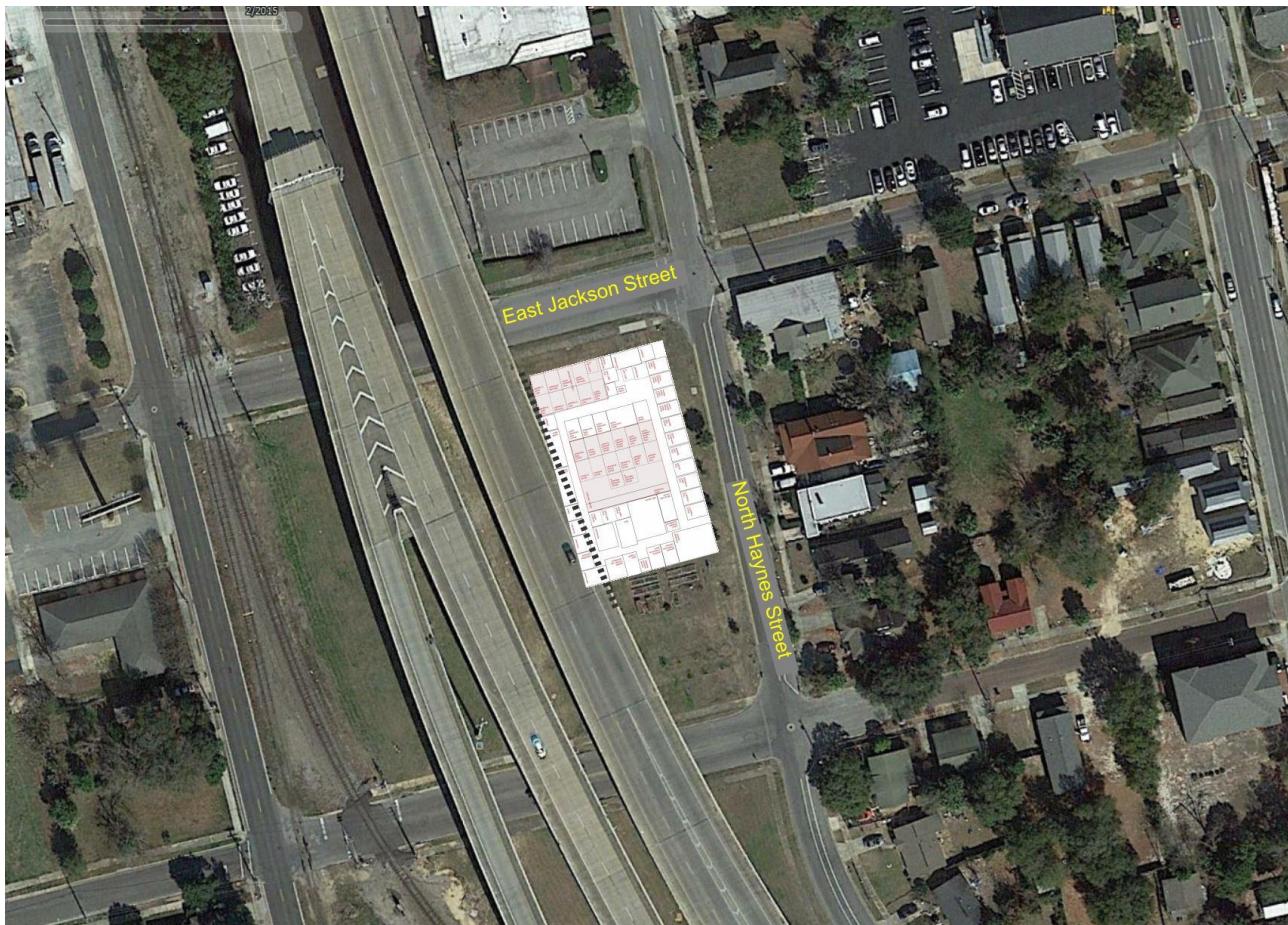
Conceptual Floor Plan on Site Adjacent to I-110 and Pensacola Police Department
